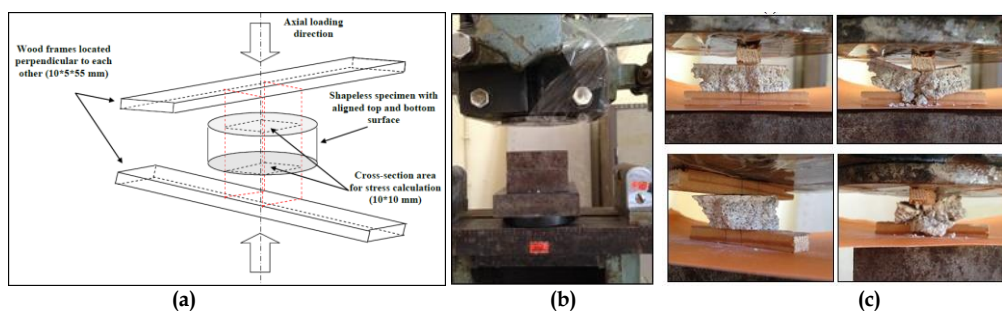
a) Loading frame scheme designed for axial compressive strength test of plaster and mortar specimens, b) Loading setup photograph, c) Specimens before loading (on the left) and after compression failure (on the right).
